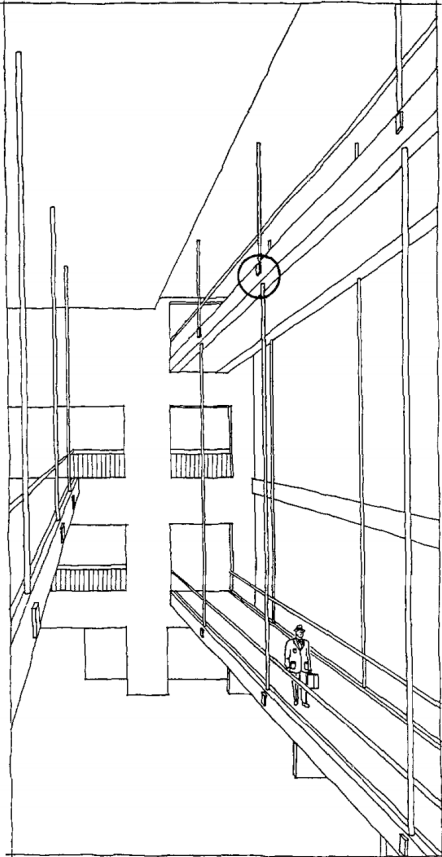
Schematic of walkways as viewed from the North wall of atrium
